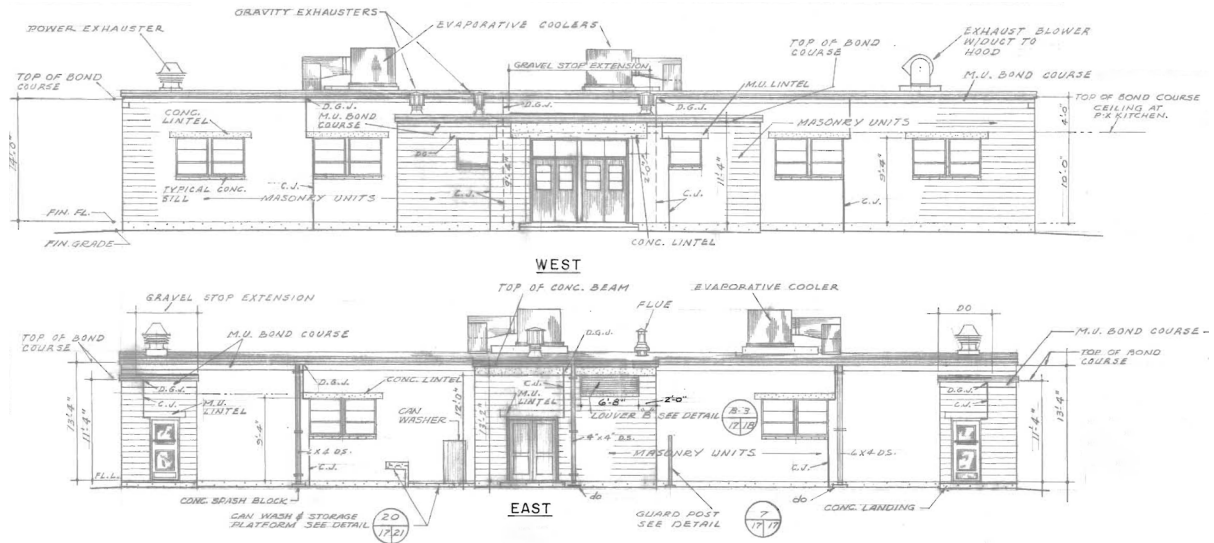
Property 23632, west and east elevations from 1959 WS-IE plans.
